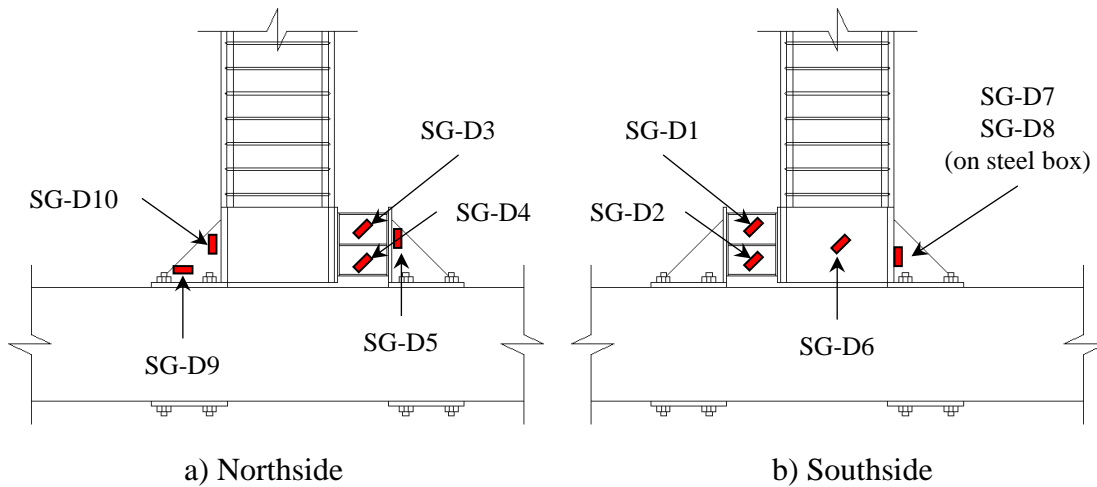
Instrumentation with SGs structural steel (specimen P-ID-1).
